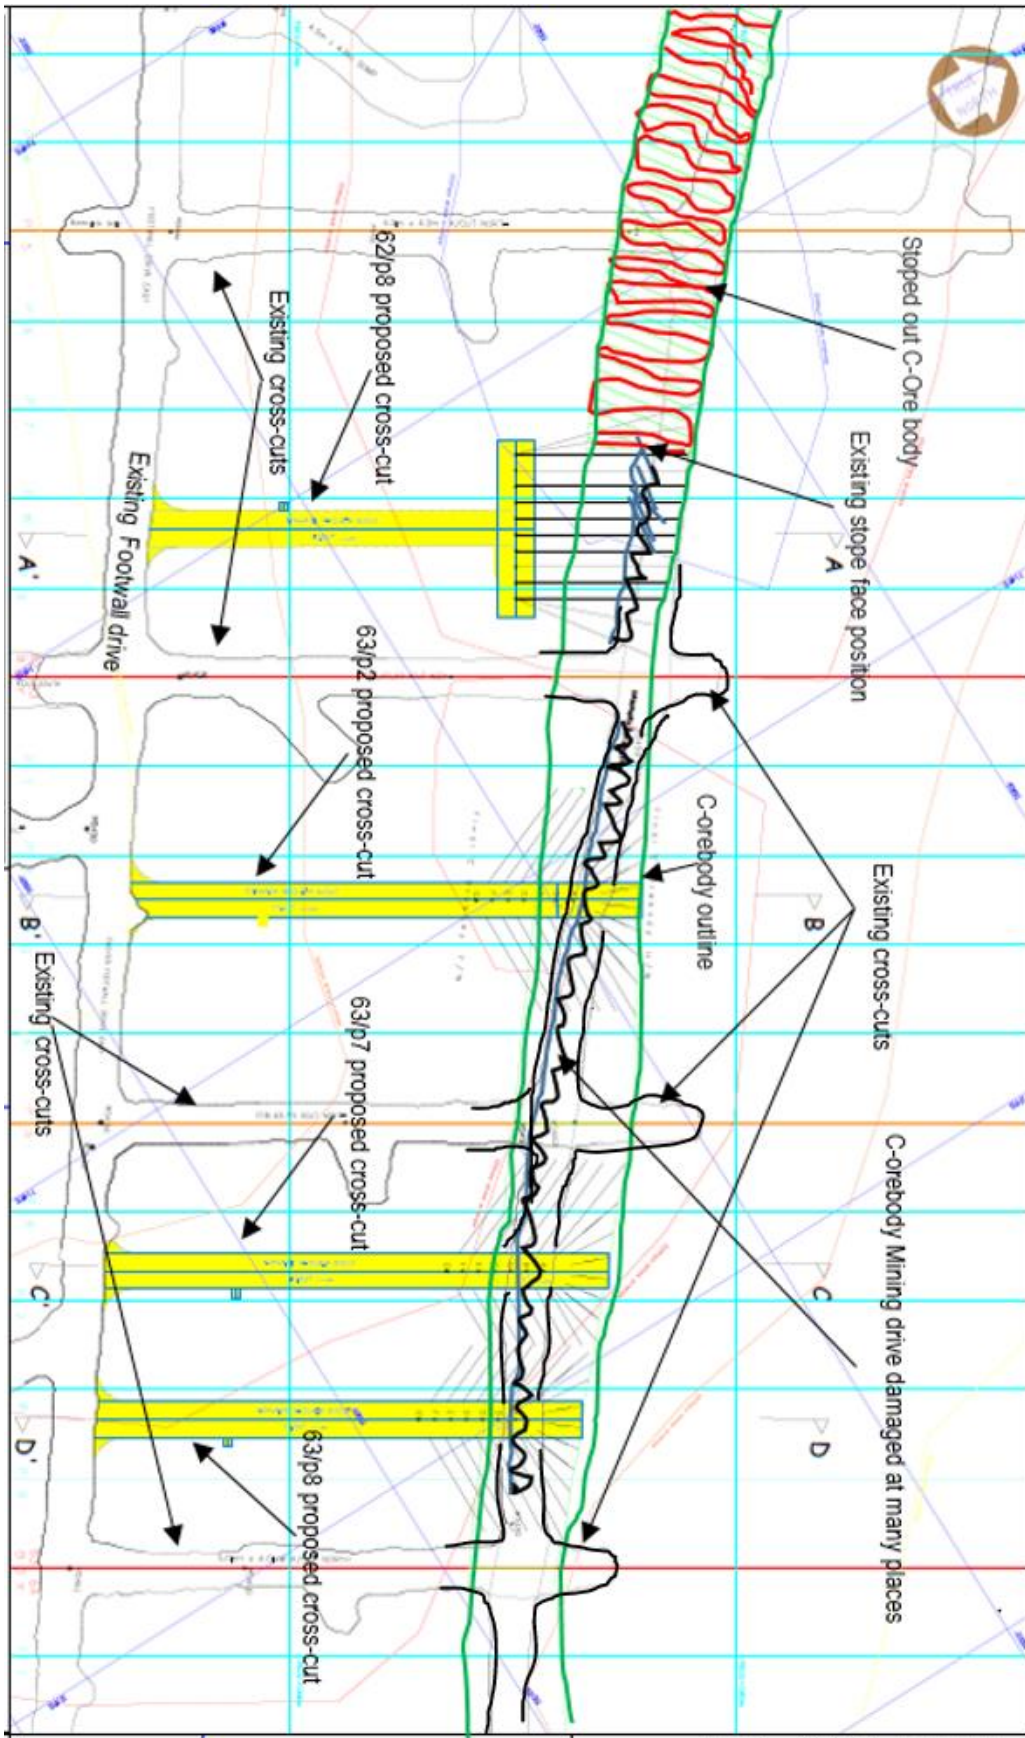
Showing 1473 mL plan on the lay-out (landscape)
